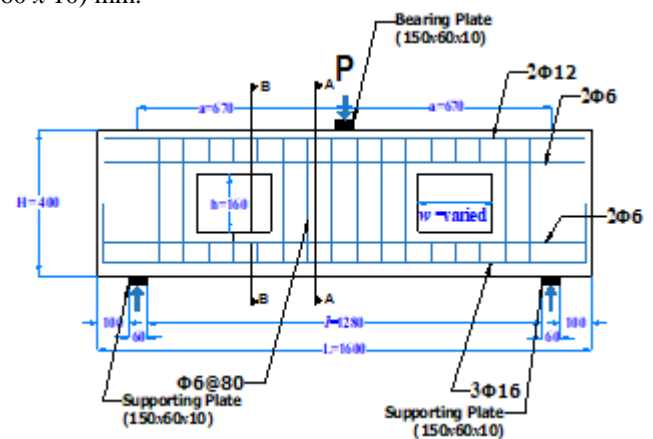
Layout of a typical tested beam for beams of Group C (beams strengthened with vertical post-tensioning strands)
